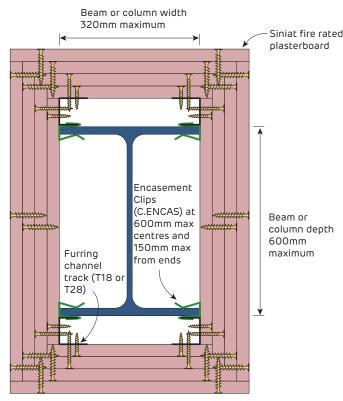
4 Sided Protection for I-Beam/Column Plan or Section
